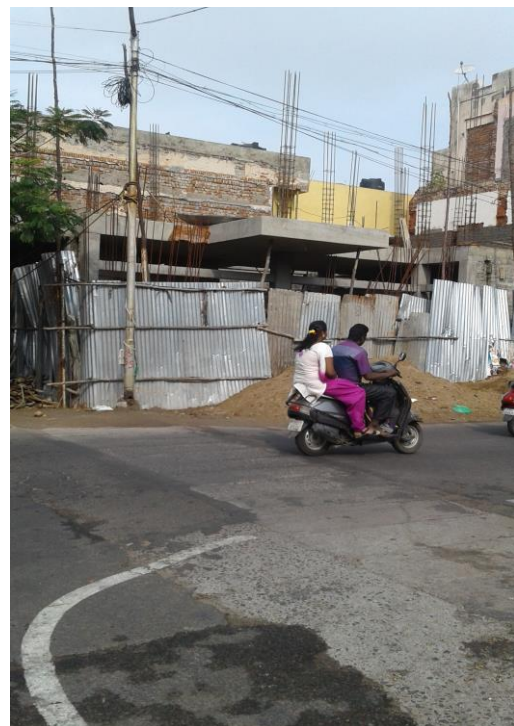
b. Scaffolding around the ‘Fish House’ under construction.
